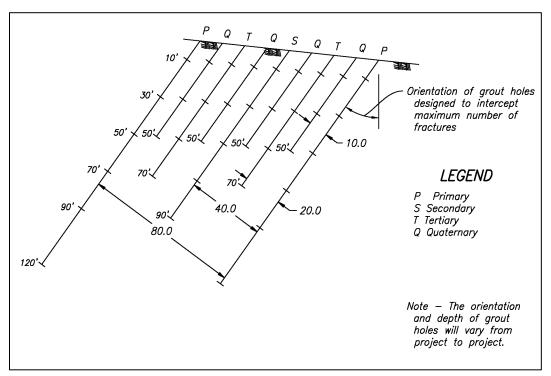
Typical Reclamation 80-foot grout hole pattern using the split spacing method.
